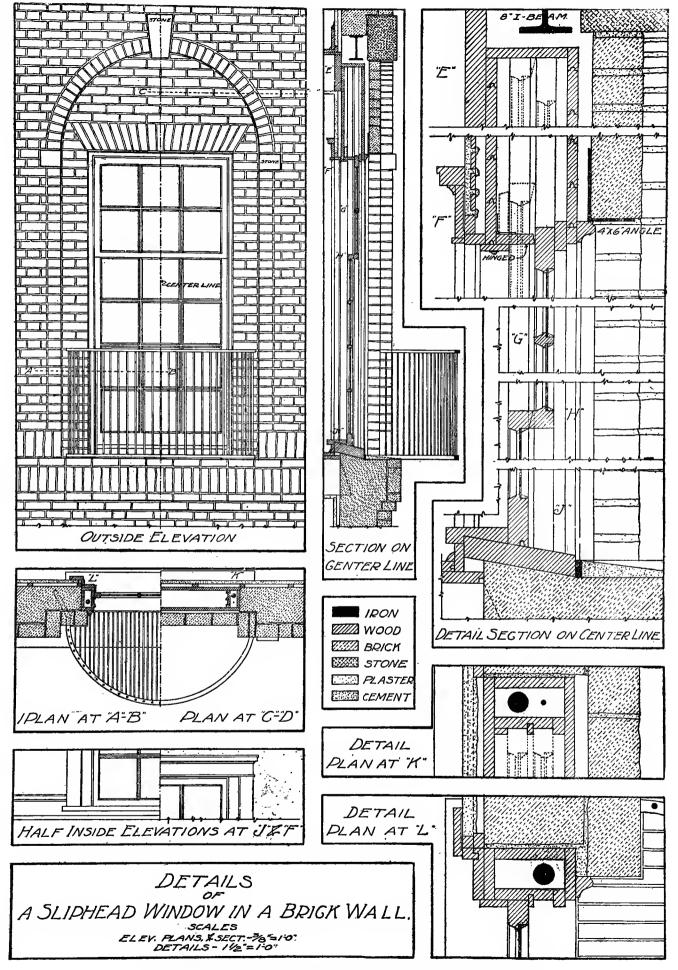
SLIP-HEAD WINDOW IN A BRICK WALL
